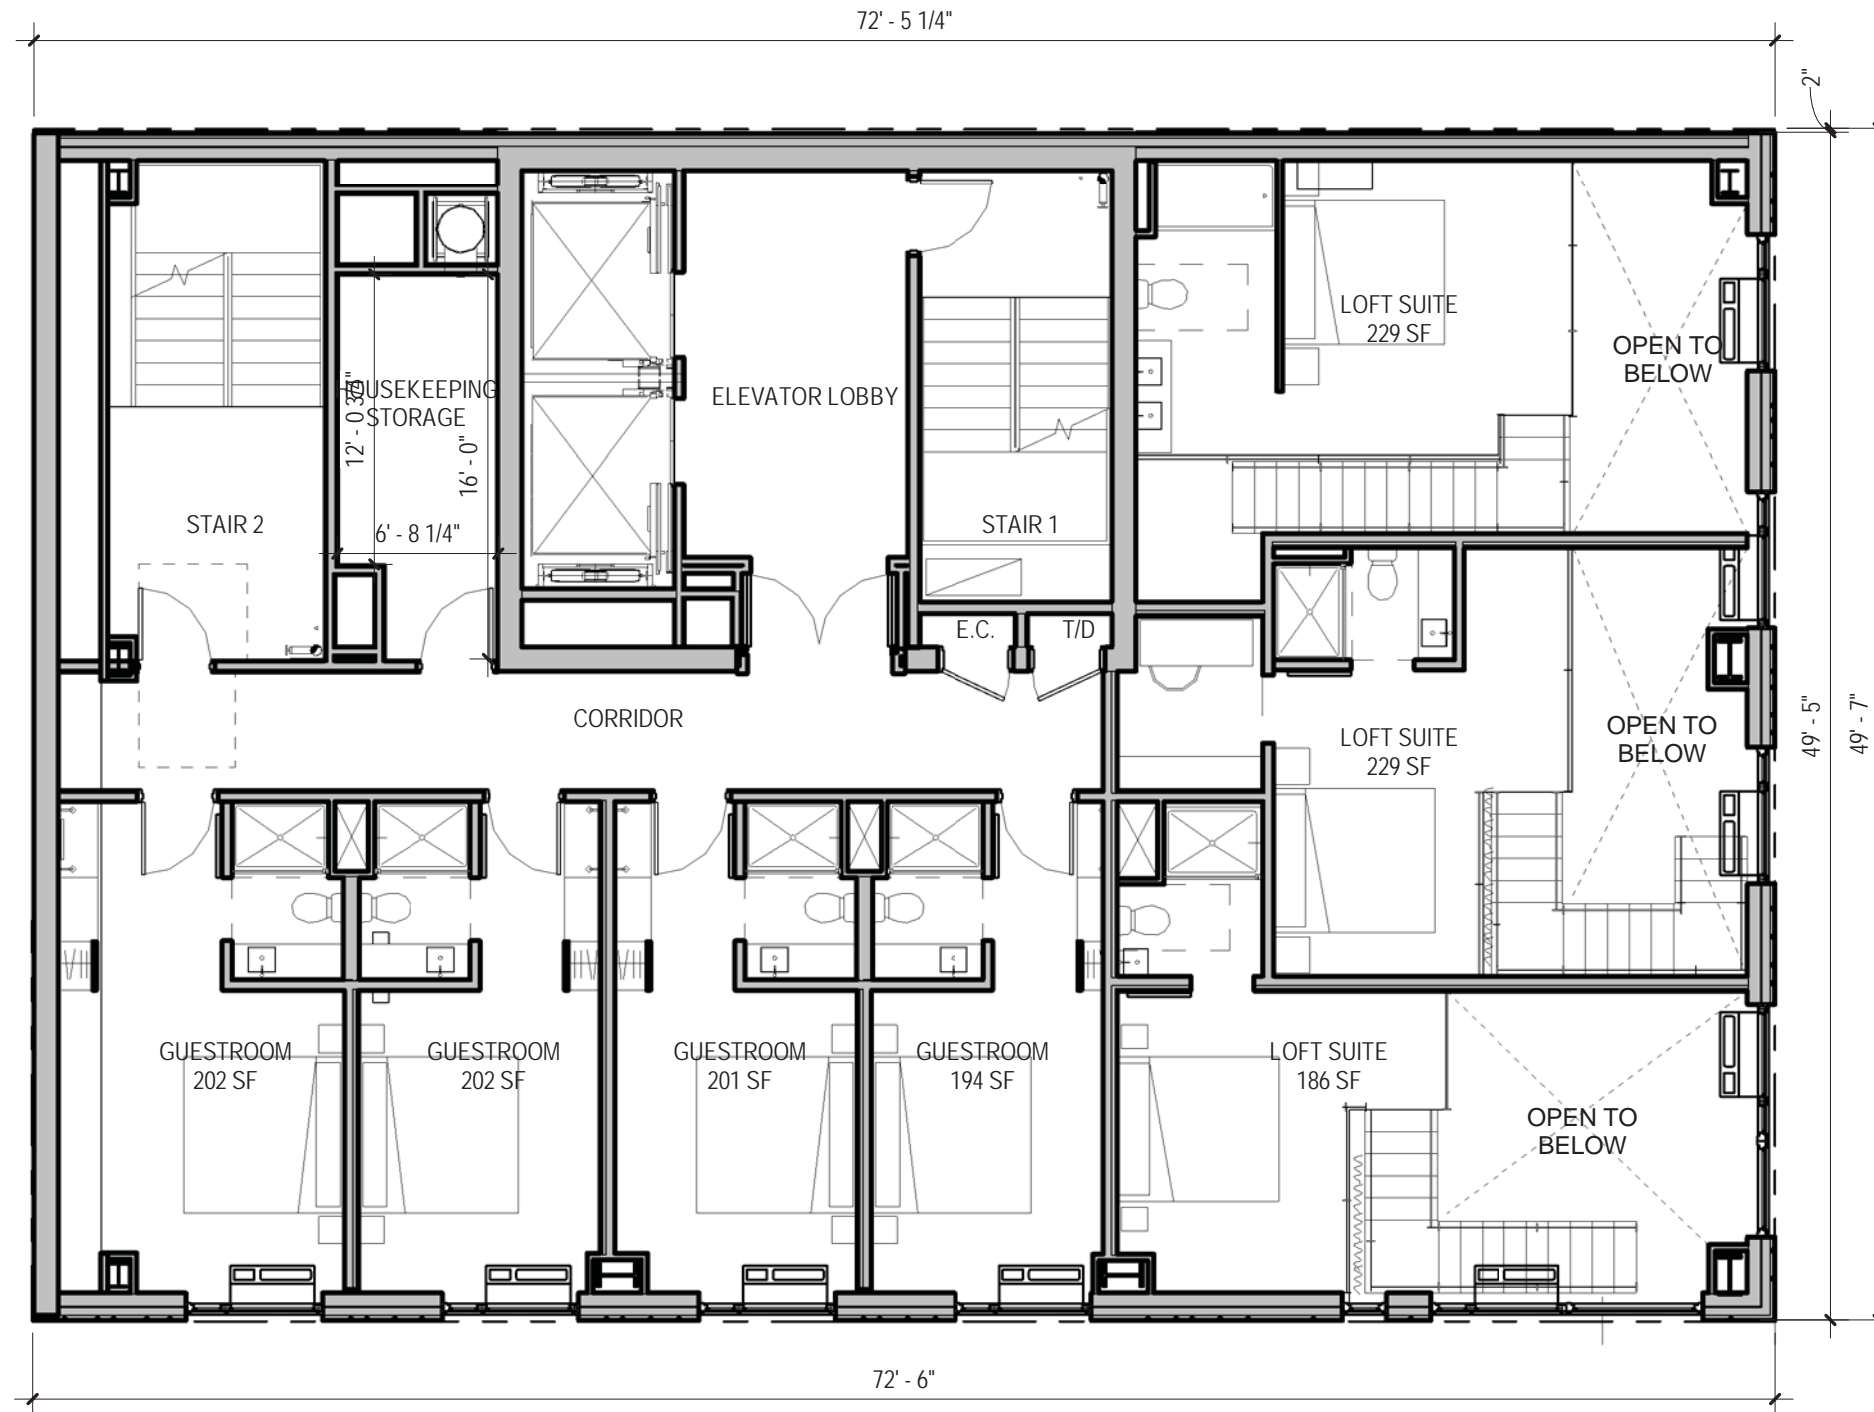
C - PROPOSED BUILDING PLANS - LEVELS 2&3
